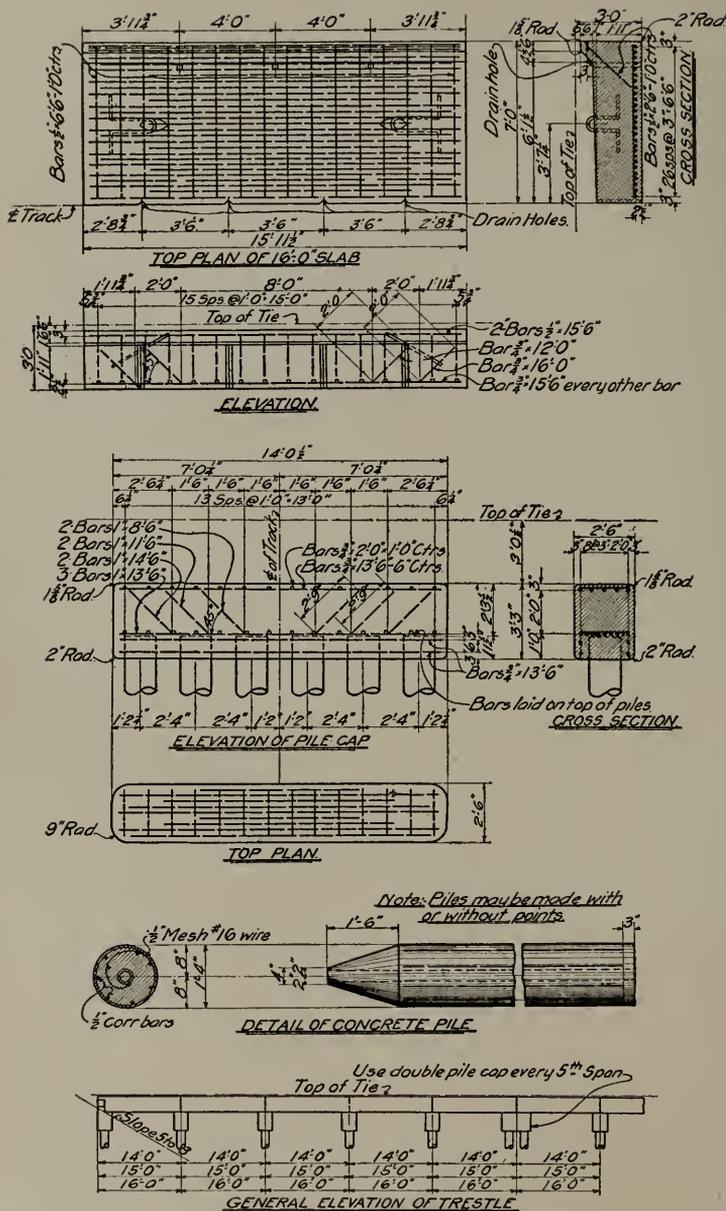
STANDARD CONCRETE PILE TRESTLE—CHICAGO, BURLINGTON & QUINCY RAILROAD.
